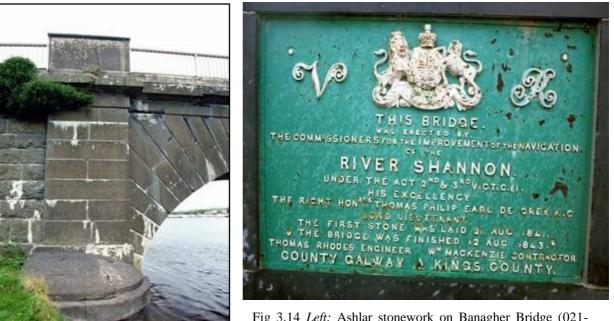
Left:* Ashlar stonework on Banagher Bridge (021-006). *Above:* Plaque recording the bridge's construction between 1841 and 1843.
